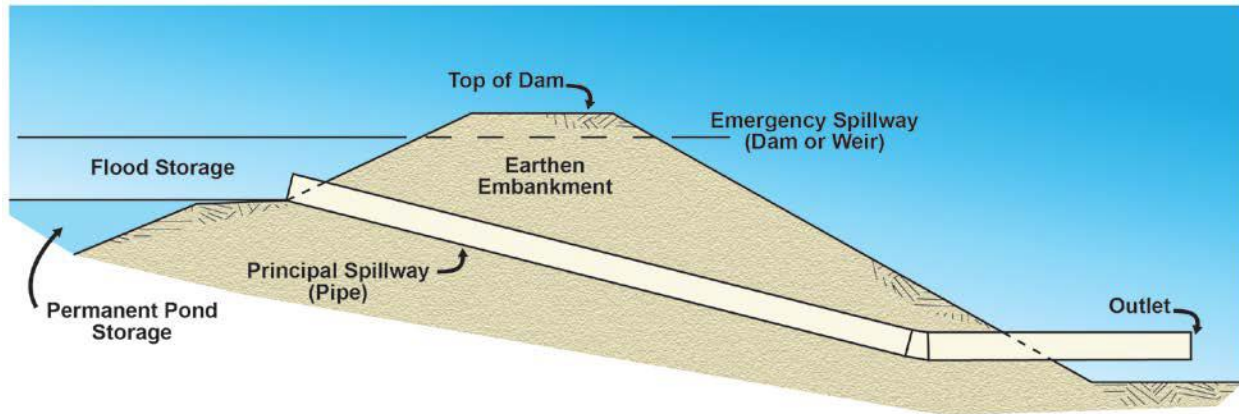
Schematic of a pond constructed to provide flood storage.
